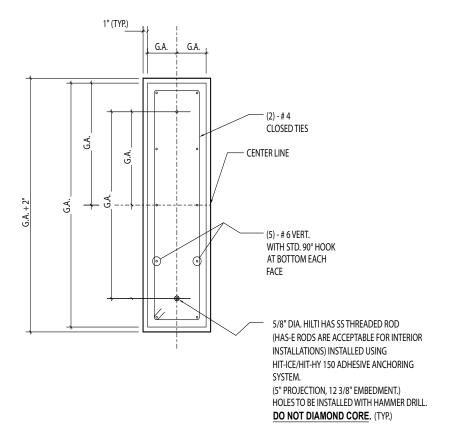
Housekeeping Pad Dimension Detail - Top View
